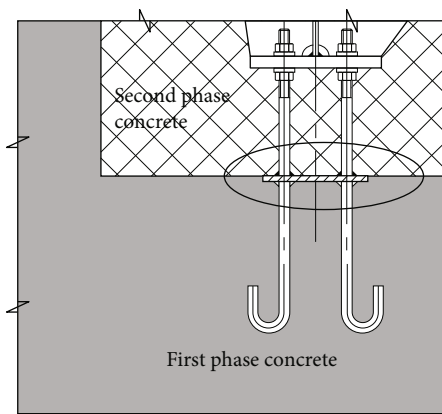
Plate and anchor connection in the first and second phases of the concrete.
